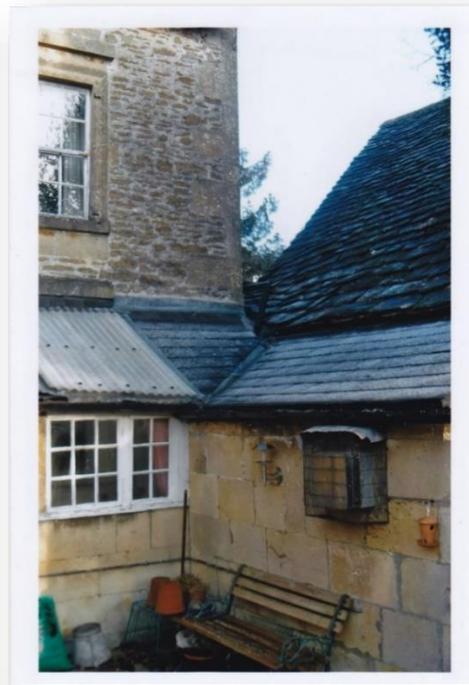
Rear Elevation and Kitchen House (Now Garden Room)
